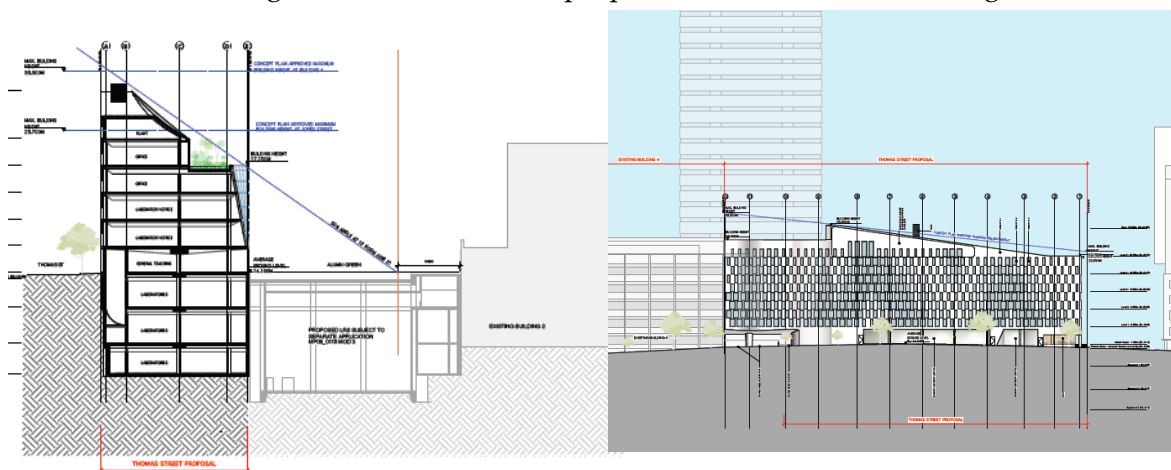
Section looking east, and north elevation views of the proposed Thomas Street Building
